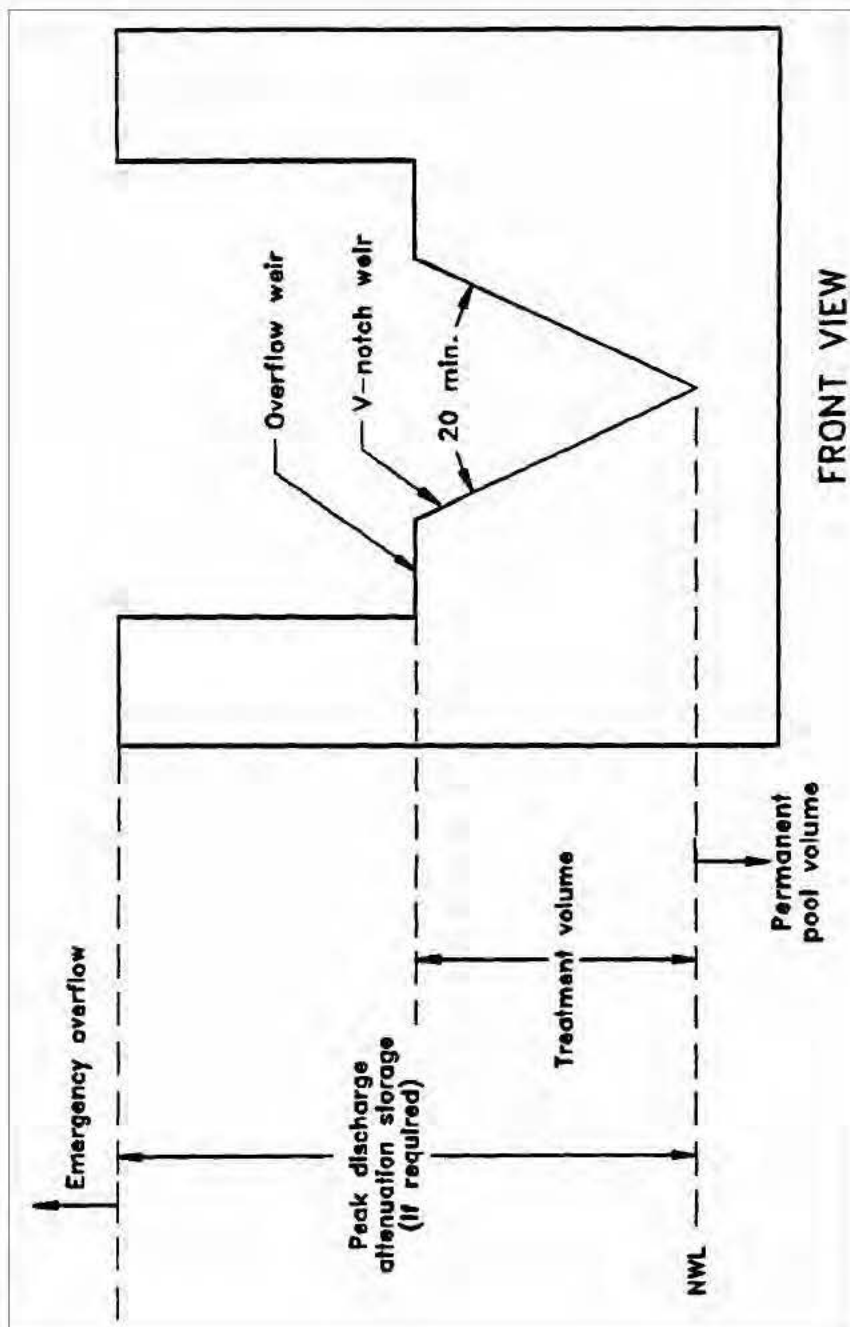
Typical wet detention outfall structure with "V"-notch weir (N.T.S.)
